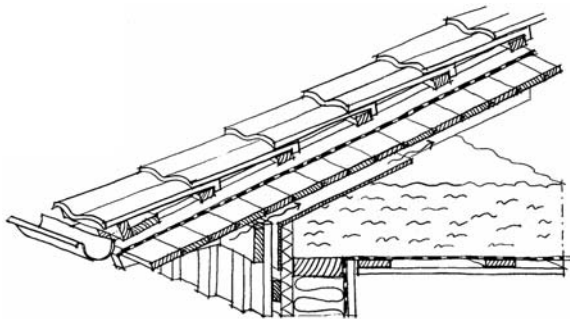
An example of a ventilated attic with loose-fill insulation and wind protection at the eaves.
